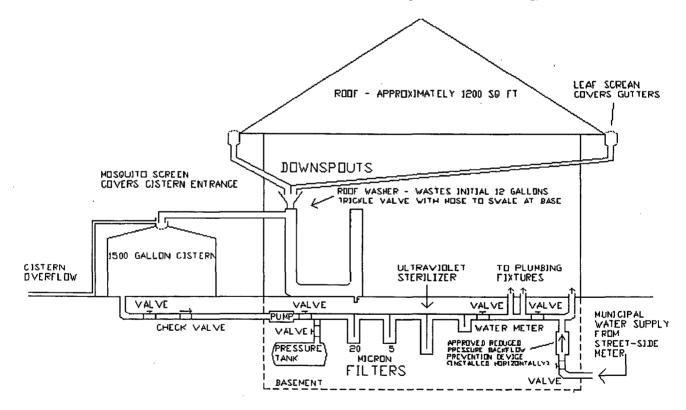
, Showing the plumbing of a house having pitched roof, which is very common in Dehradun and other heavy rainfed areas.
